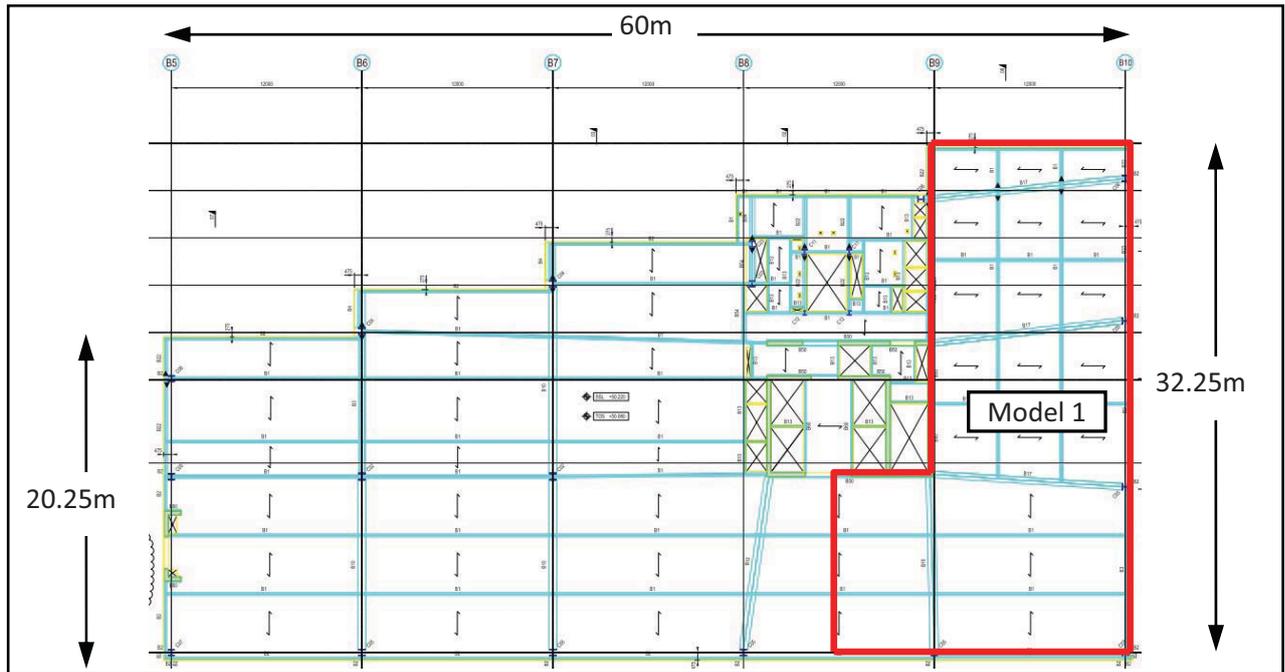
Typical floor plan - Compartmentation Model 1
